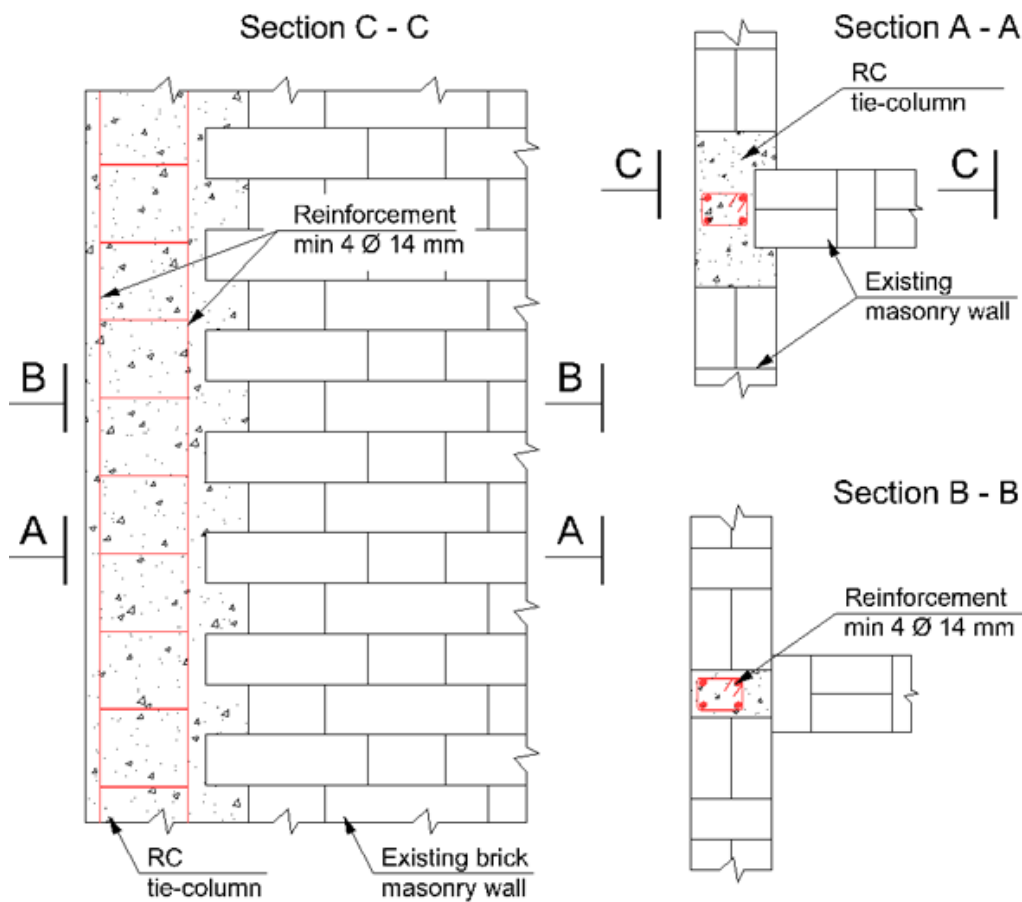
Construction of new tie-column at T junction in brick masonry wall
